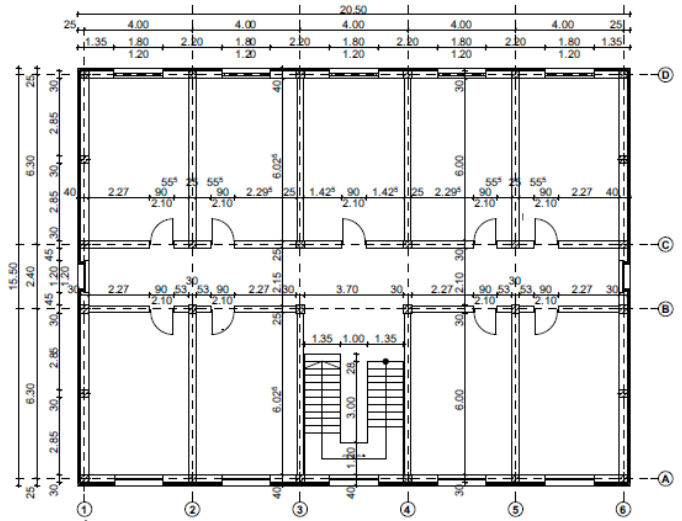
Floor layout – Masonry bearing walls with RC tie-beams and pillars
